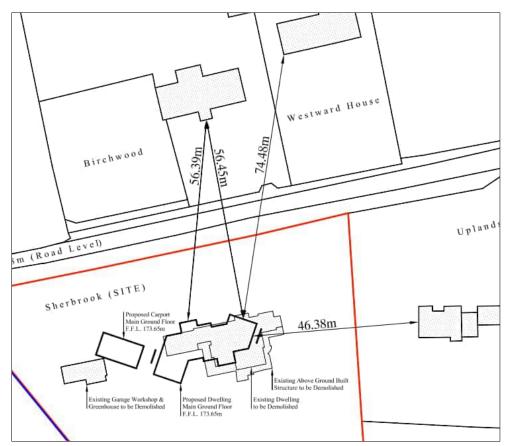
Separation Distances to nearby properties taken from Proposed Block Plan
